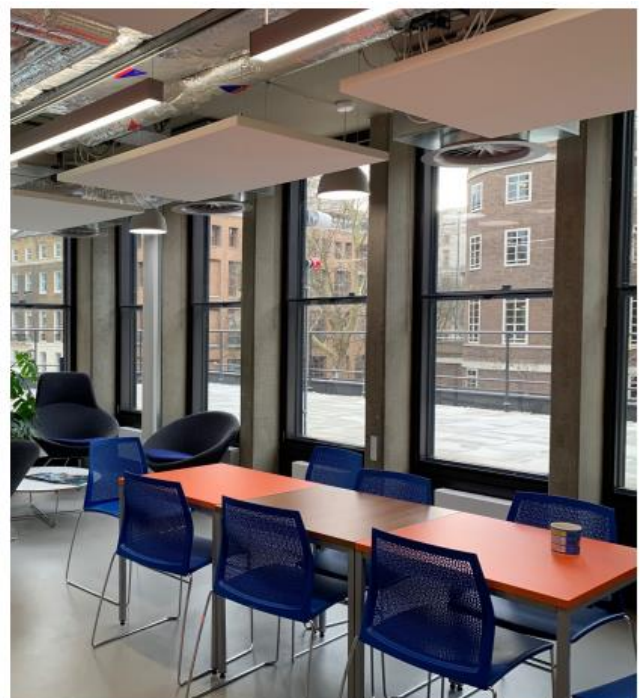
3 Main façade detail, where the opaque panel was insulated internally, and the glazing was upgraded with single glazed secondary glazing. The concrete fins and slab edge were not insulated due to heritage restrictions.
